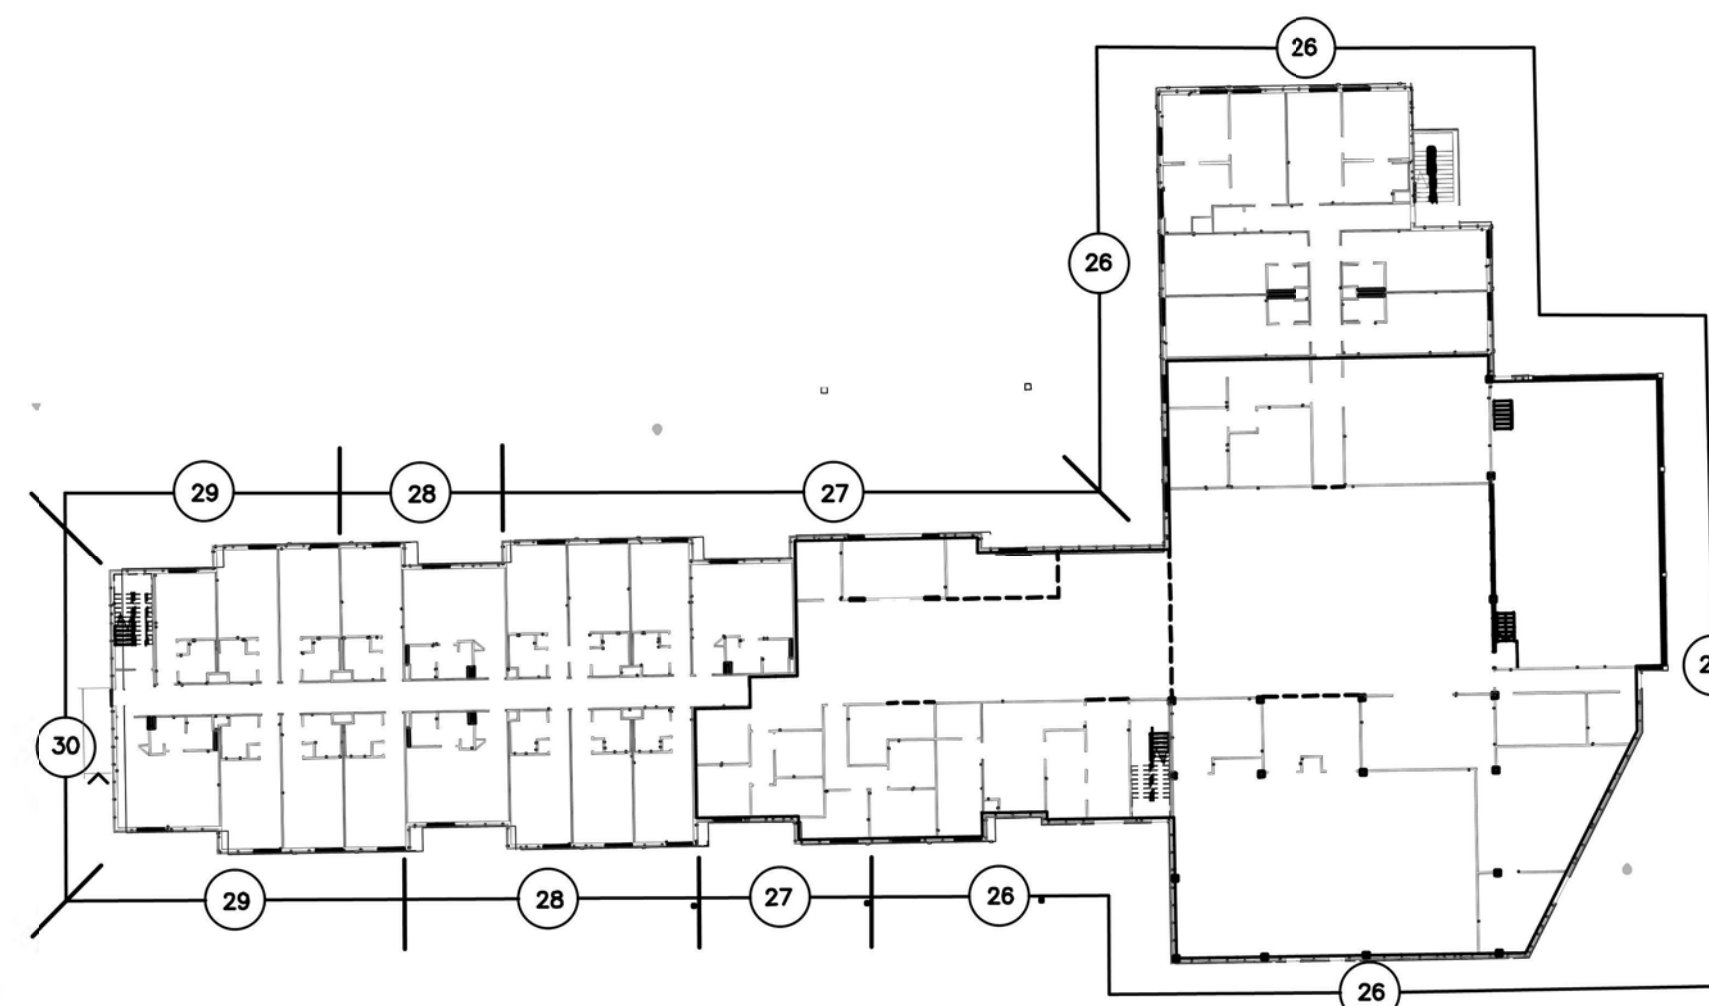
HILTON SAN RAFAEL MINIMUM RECOMMENDED OITC RATINGS FOR WINDOWS (GROUND & FLOOR 2)
